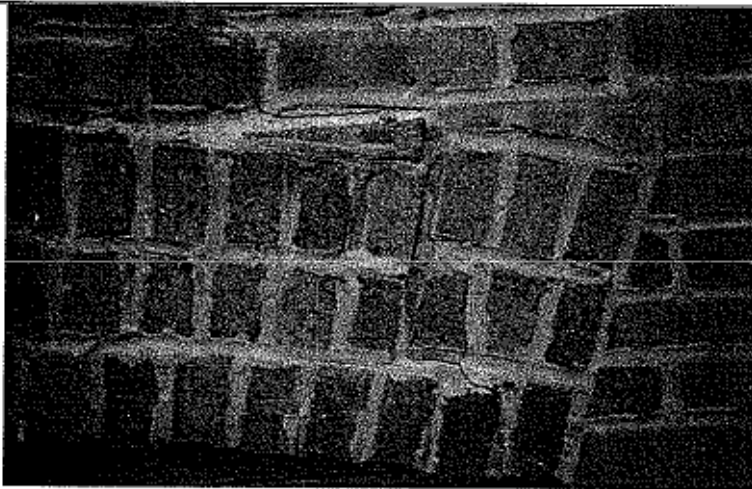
Cracked and loose mortar joints below window sills. Typical condition found on the east, west and south elevations.
